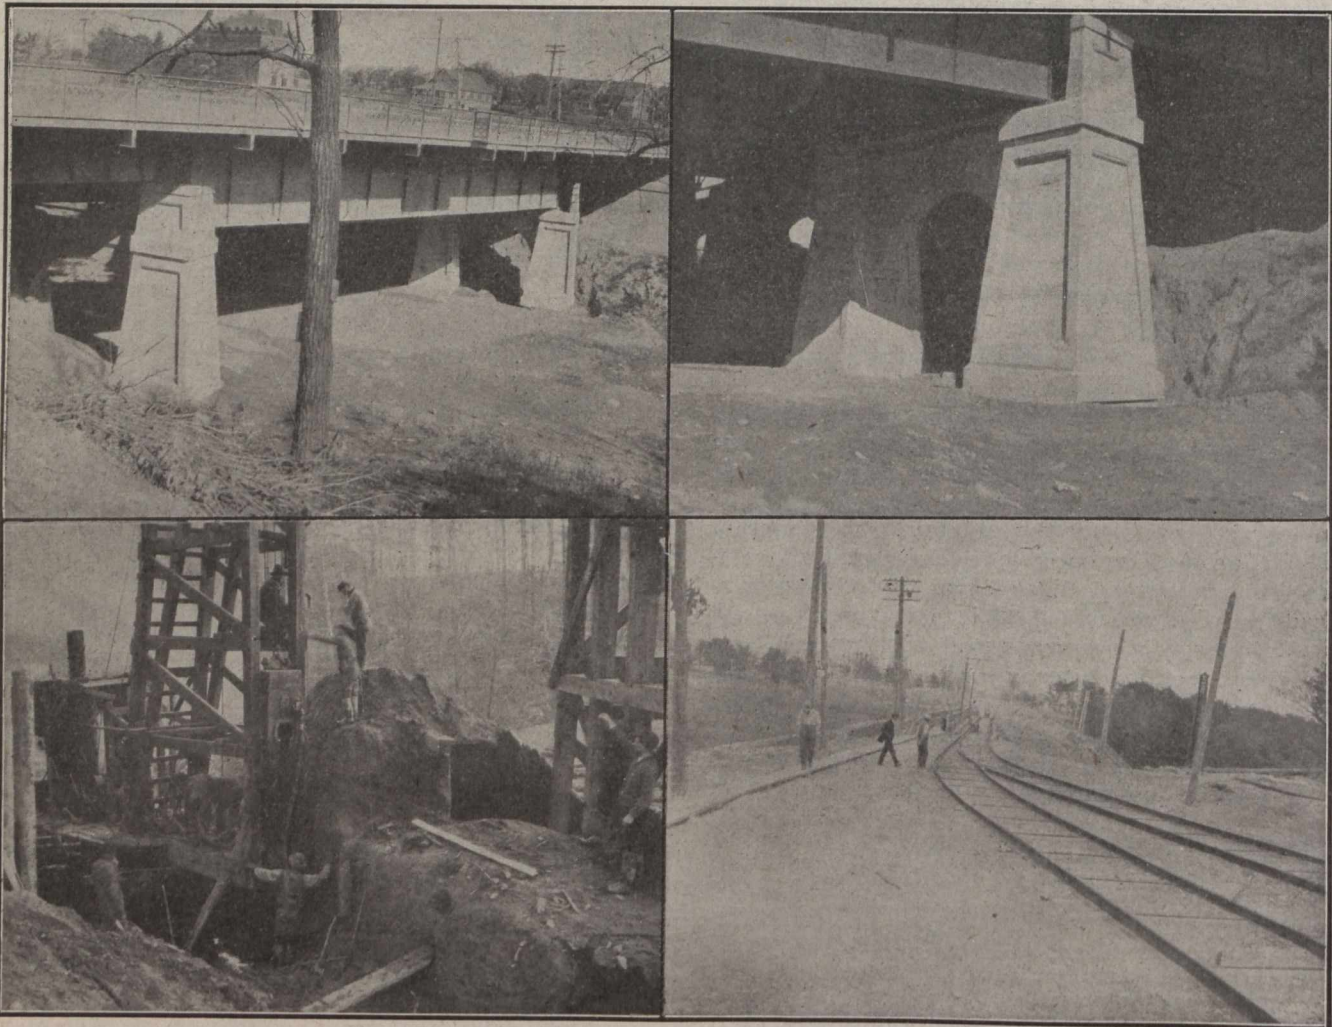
View of Completed Structure; Closer View of Pier, East Abutment; Pile Driver at Work on East Abutment; Gauntlet Track Under Construction on Temporary Trestle.
